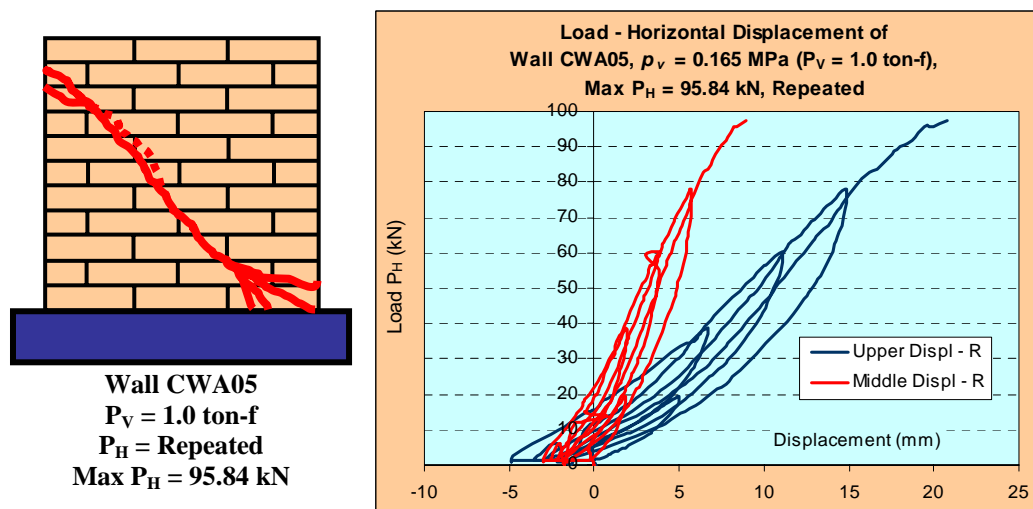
Failure pattern and load-displacement of wall CWA05
